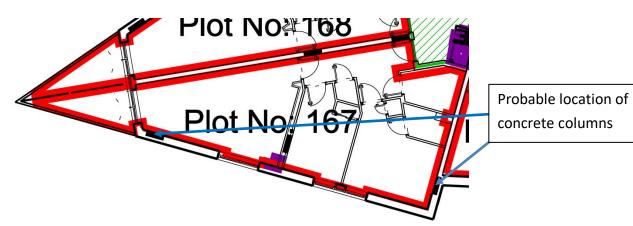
Coheating Test Plot General Arrangement Plan Drawing showing Column Location
